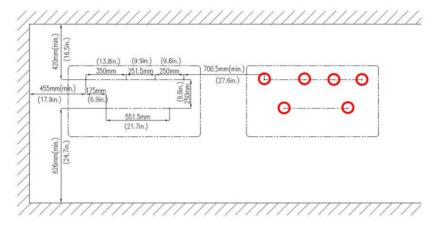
100/125kW Standard Wire-box Bracket Mounting Pattern
